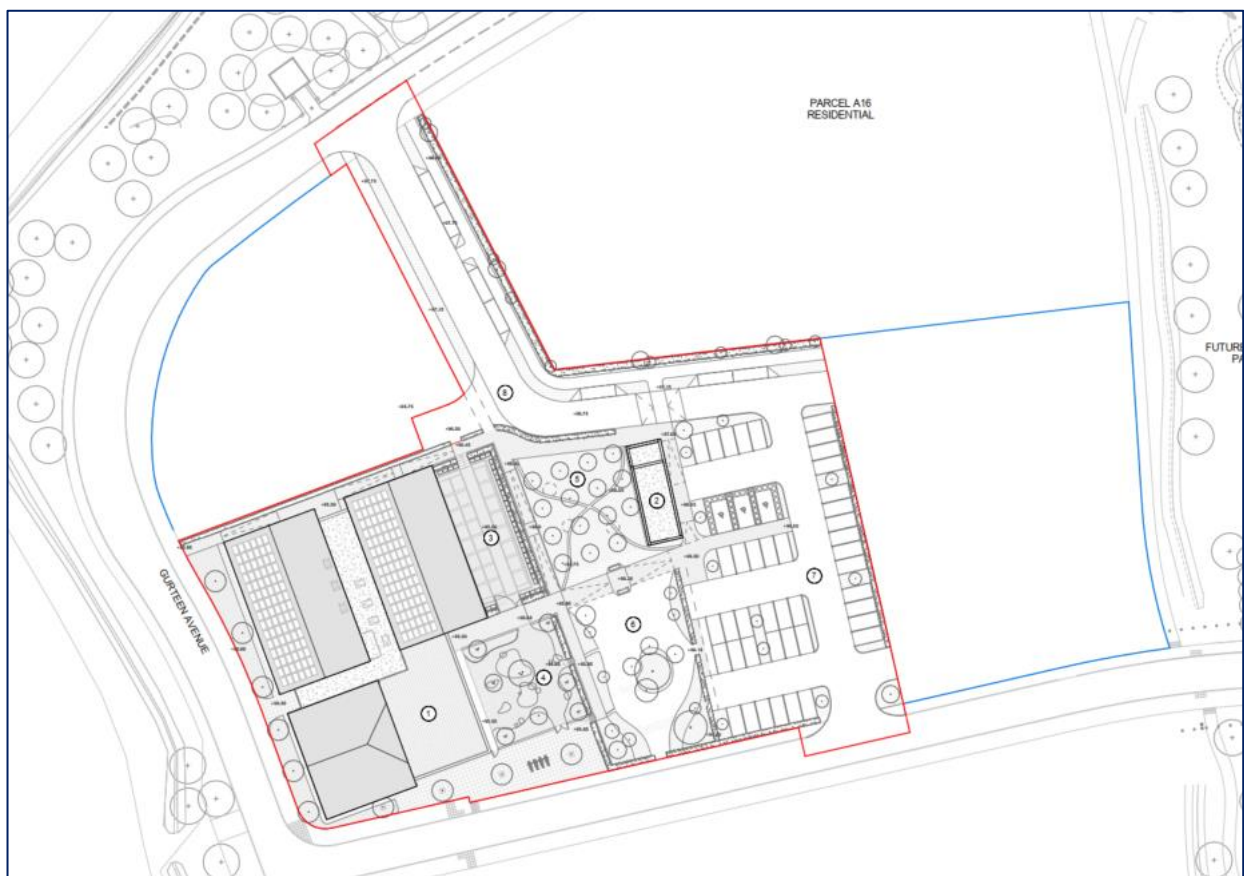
excerpt from the Proposed Site Plan, prepared by PTE Architects.
